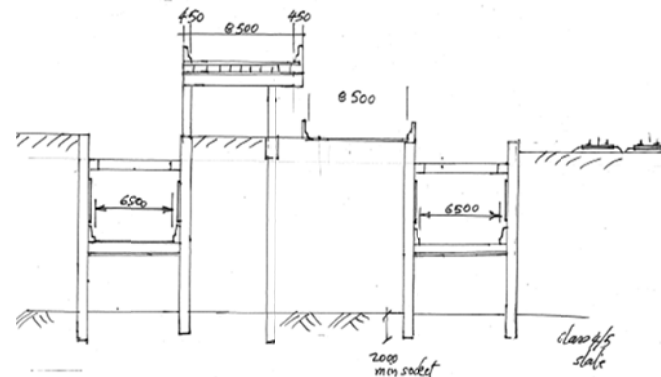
IWT Typical Cut Structure Bellevue Street with elevated ramp connections
